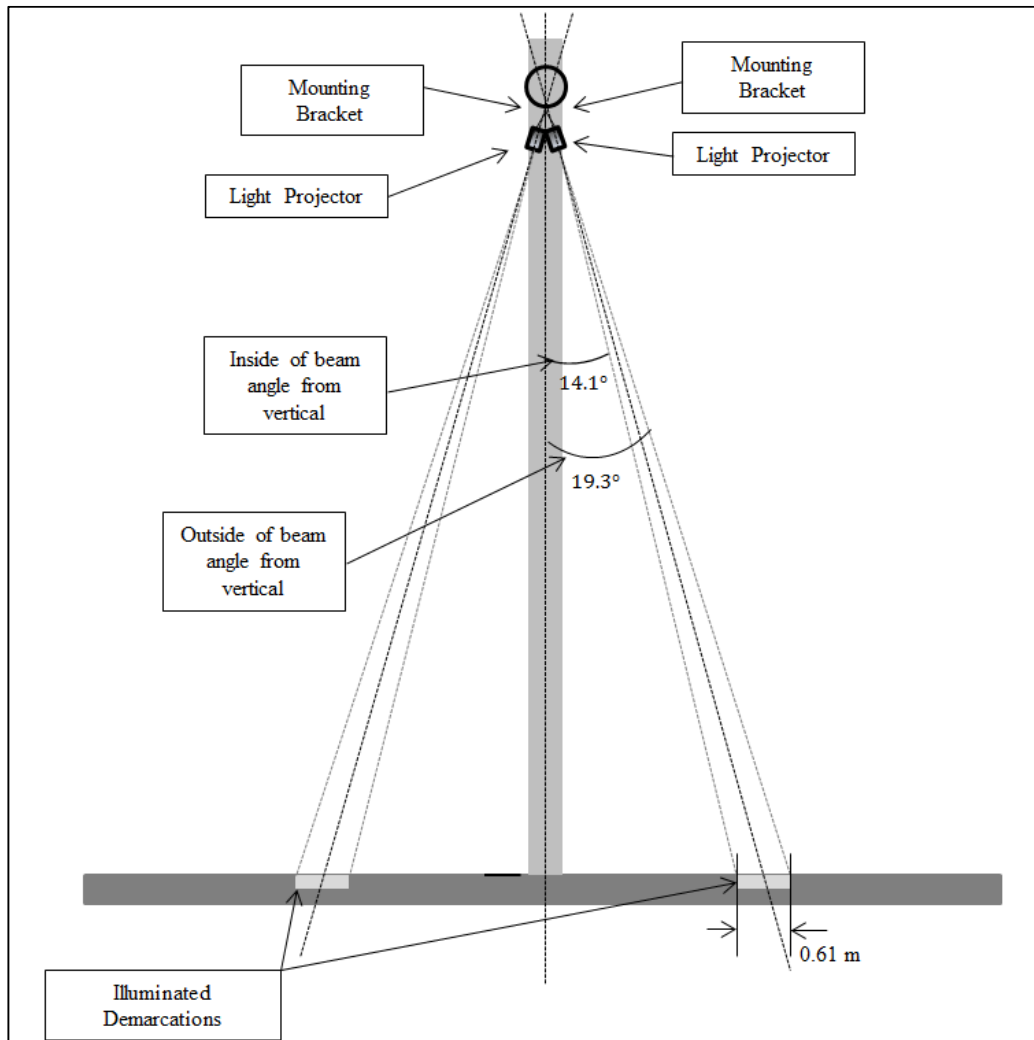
Crosswalk cross section view of installed projectors and light patterns.
